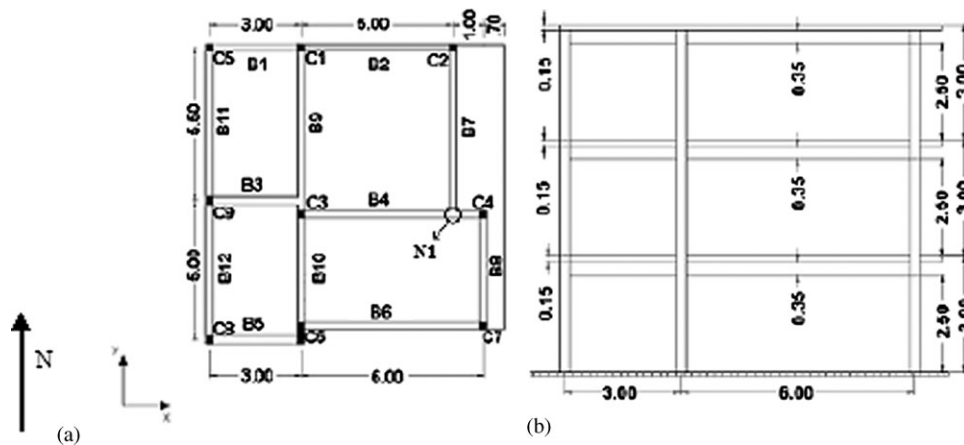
Three-storey building: (a) plan view and (b) lateral view (units in metres).
